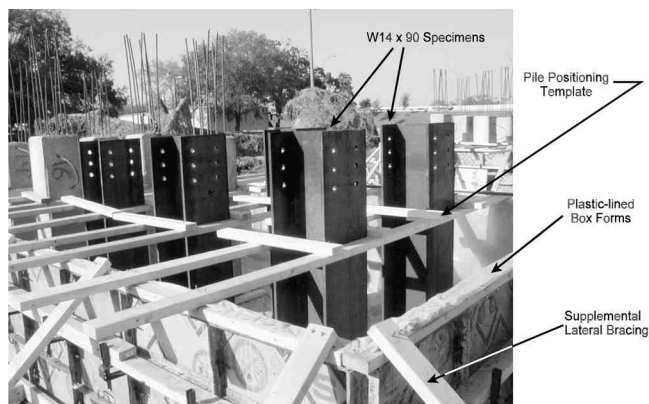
Steel piles in simulated cofferdam. (Prestressed piles were also tested in the same bed.)
